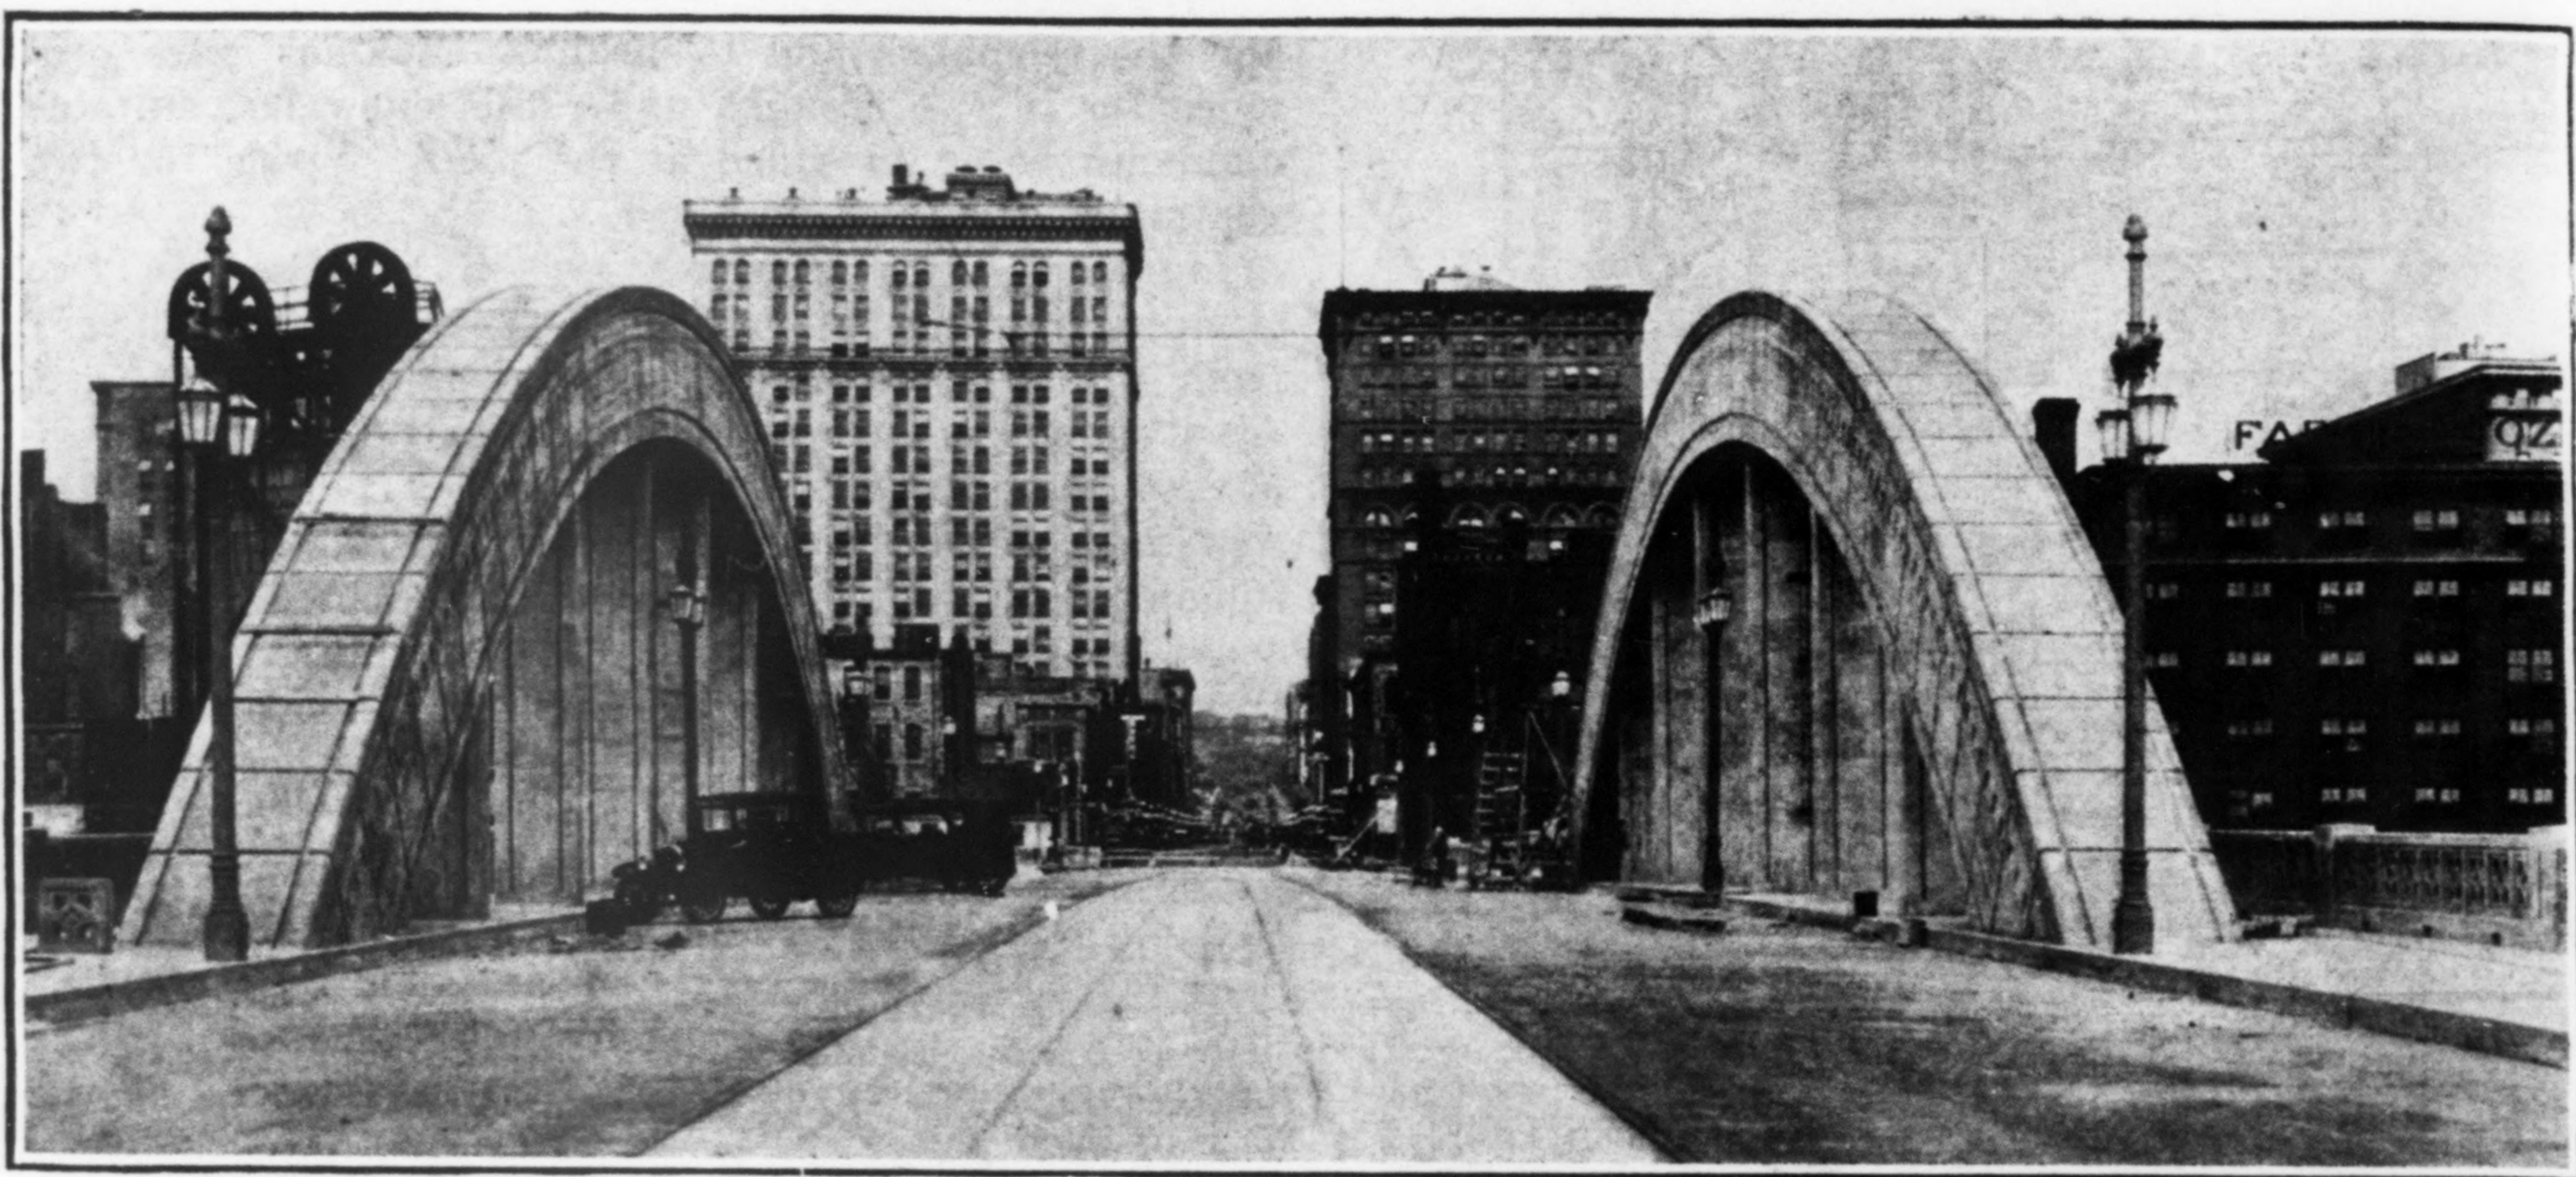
DECK OF THROUGH-ARCH SPAN OF ROBERT ST. BRIDGE
